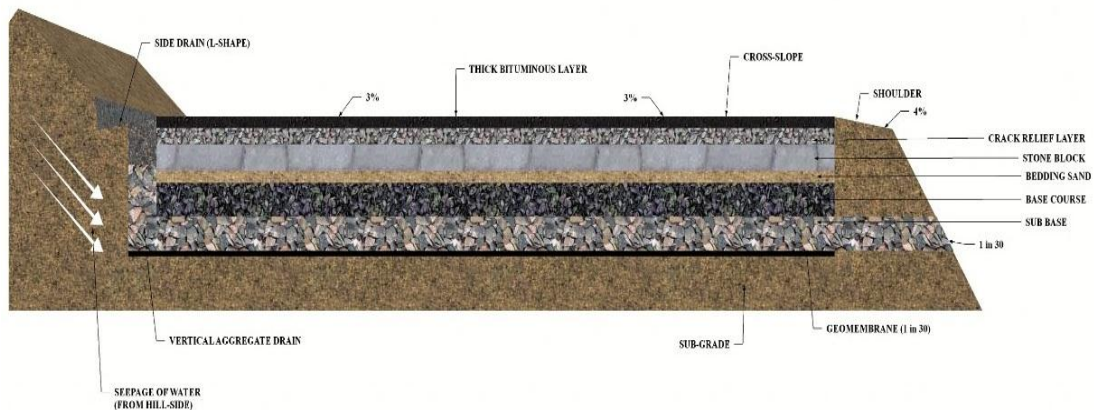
Typical cross section of heavy traffic volume road for weak rock, high water table and seepage from the hillside
